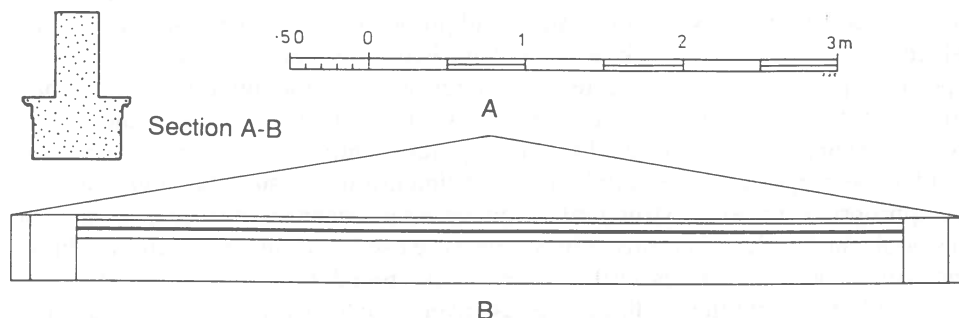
Stone beam supporting a marble coffered ceiling over the porch (pronaos) of a temple at Samothrace (6.15 metre span). [Coulton 1977:146]
